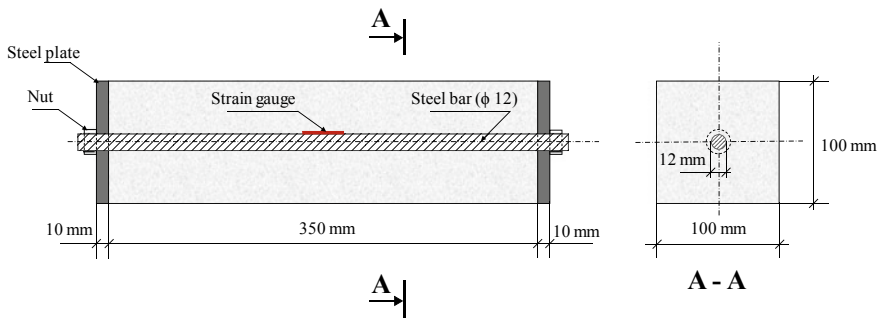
Profiles of a specimen for testing internal restrained shrinkage
